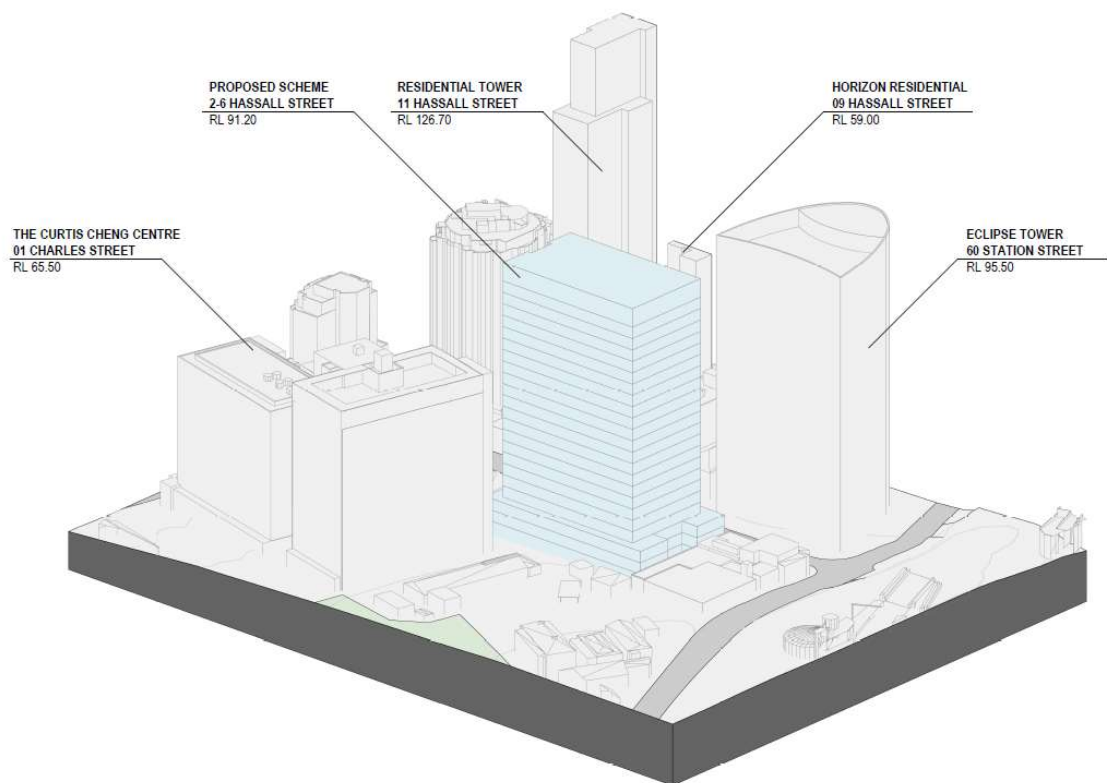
Indicative built form massing surrounding the subject site (source: Architectus, 2018).
